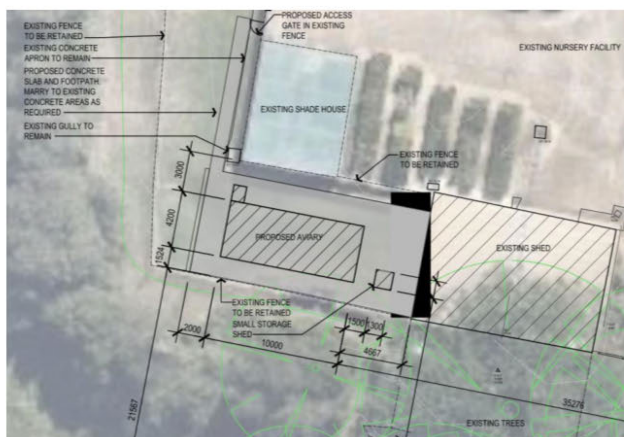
Architectural Site plan of proposed Aviary location (Source: MDP Architectural Site Plan)
